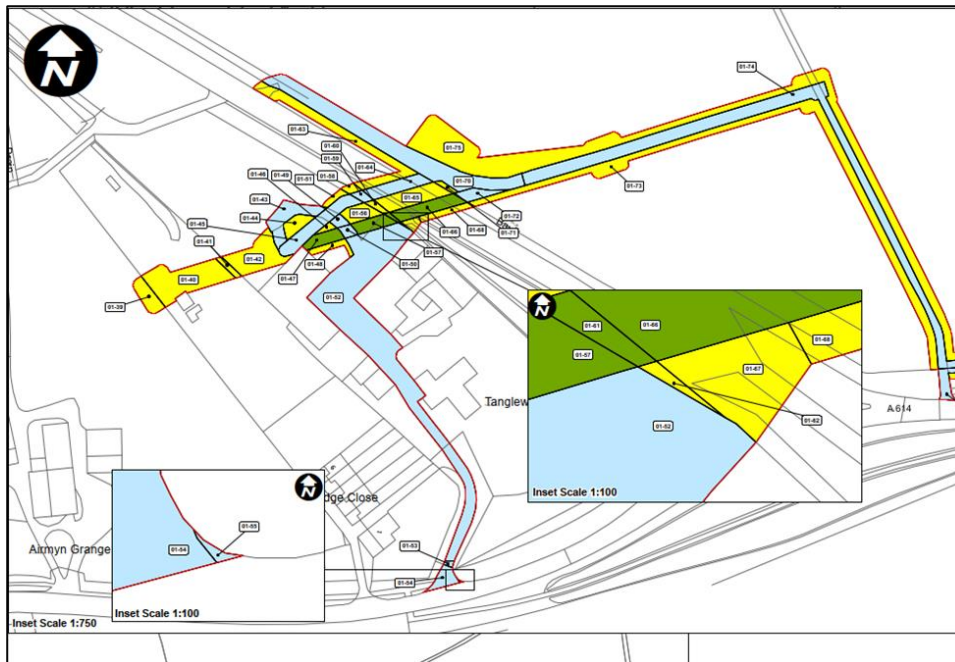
Extract from Current Land Plan for OHL1 Works – Plan 2.2 – Rev P02, Sheet 03
